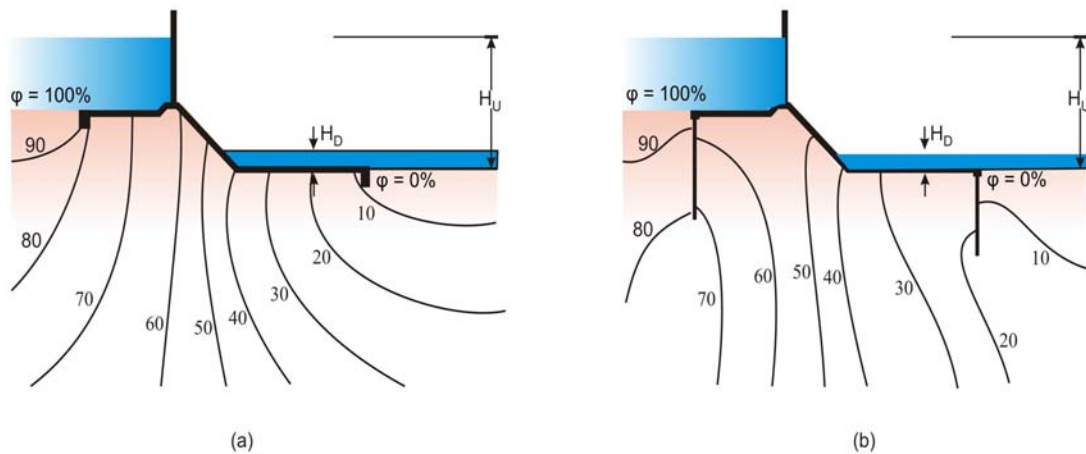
Distribution of equipotential lines (a) Barrage floor without sheet piles ; (b) Barrage floor with sheet piles at upstream and downstream ends
